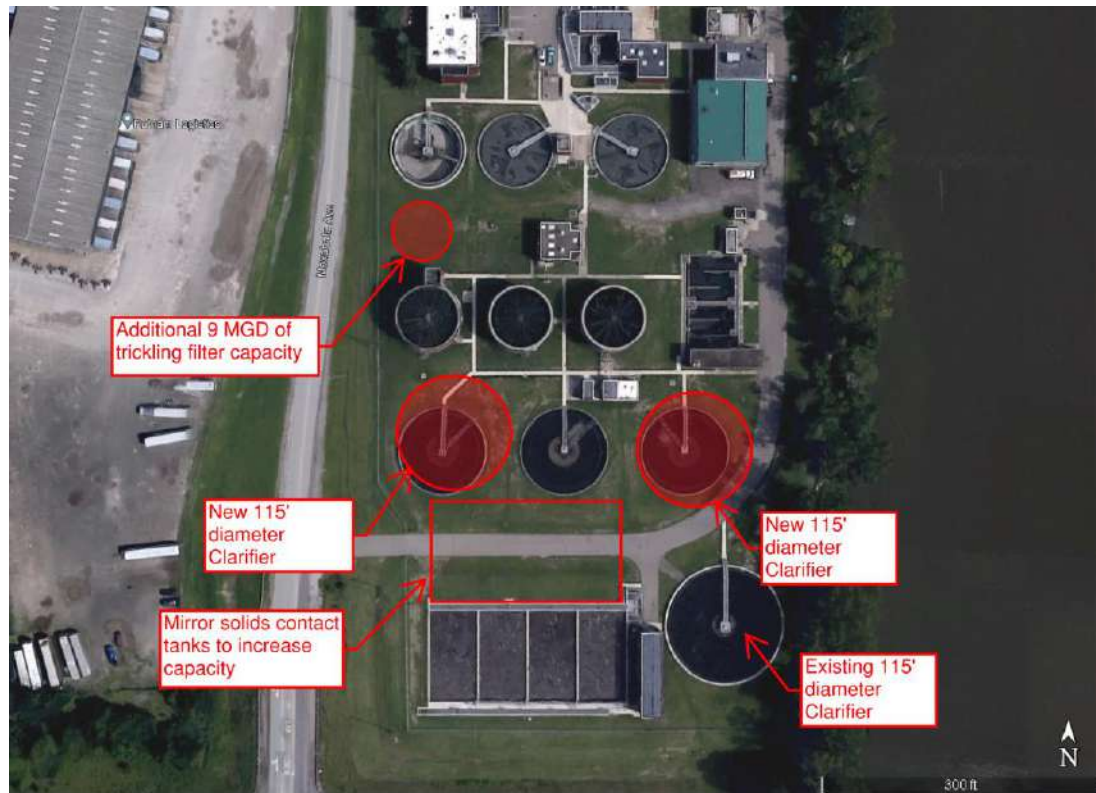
Alternative 1 (Secondary Treatment Upgrades) Conceptual Site Layout
